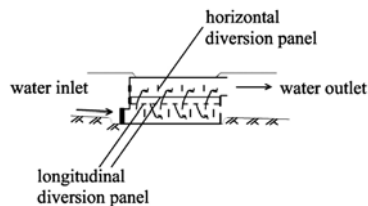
Longitudinal sections drawing of two-way permeable neutralization well.
